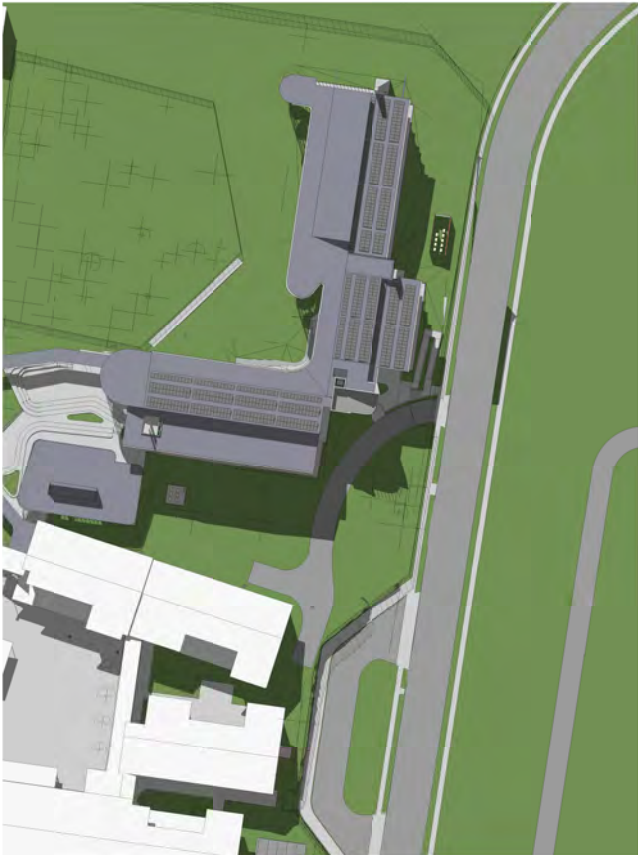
Site plan extract depicting the shadows of the proposed development at 1 pm
